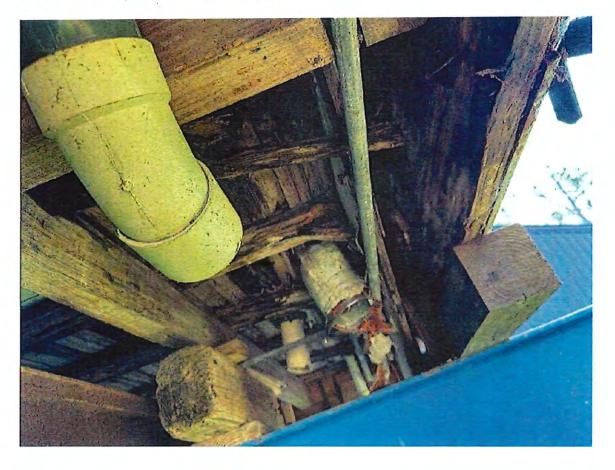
House on Frame Showing Wood Frame Shoring/Repair
